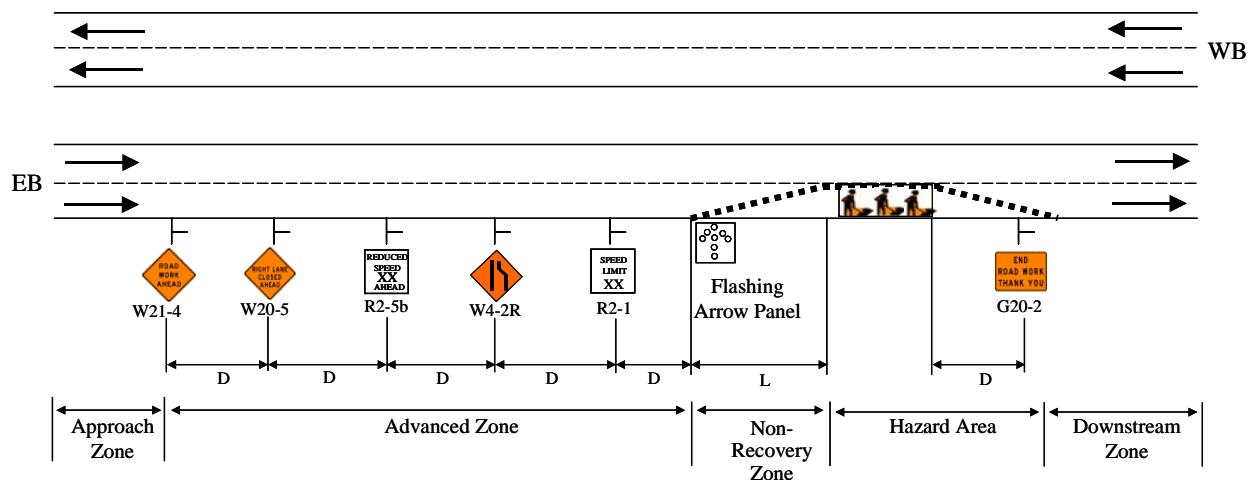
Information Handling Zones Applied to a Typical Highway Work Zone
